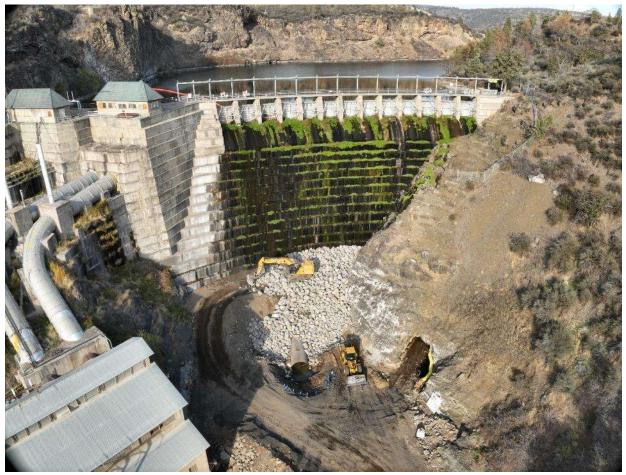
Construction of the Low-Level Outlet Protection Embankment. (Credit: Kiewit)
